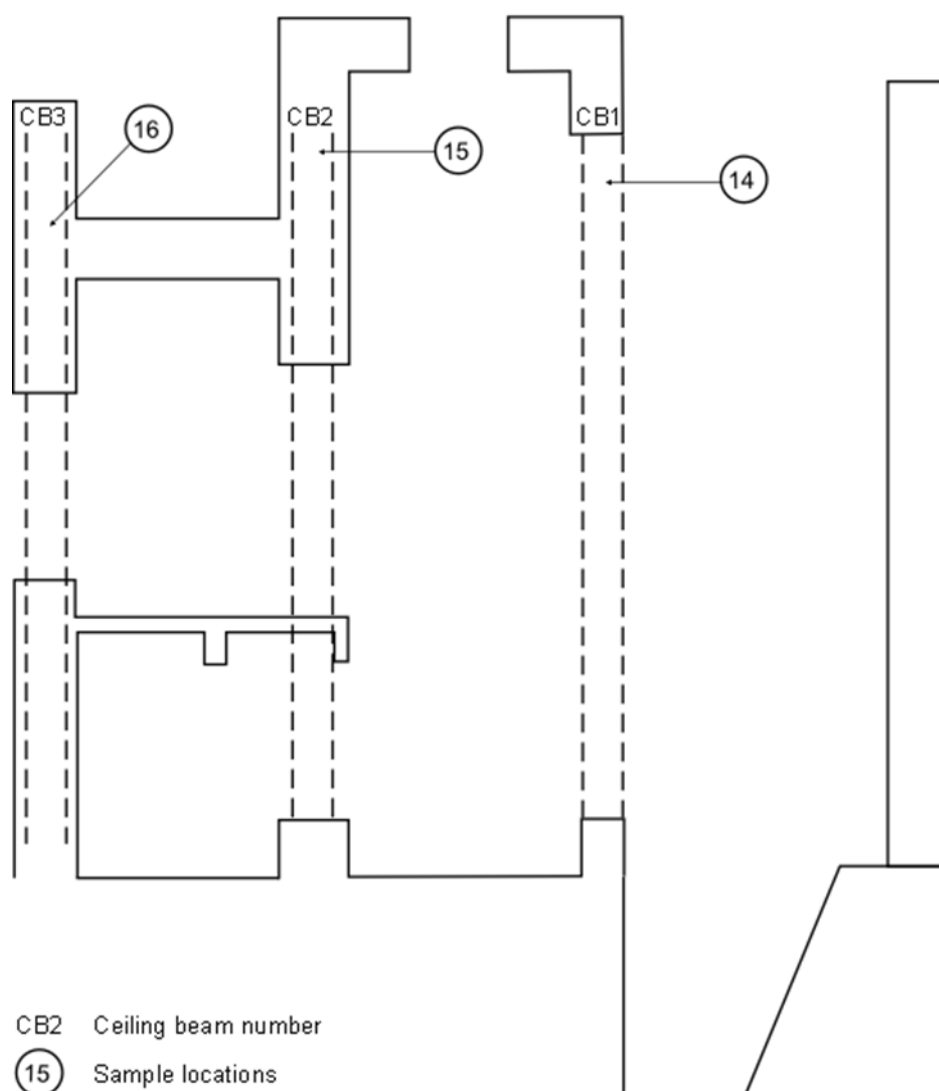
Sketch plan (not to scale) showing the location of samples TEG-L14–16 within the cellar.
